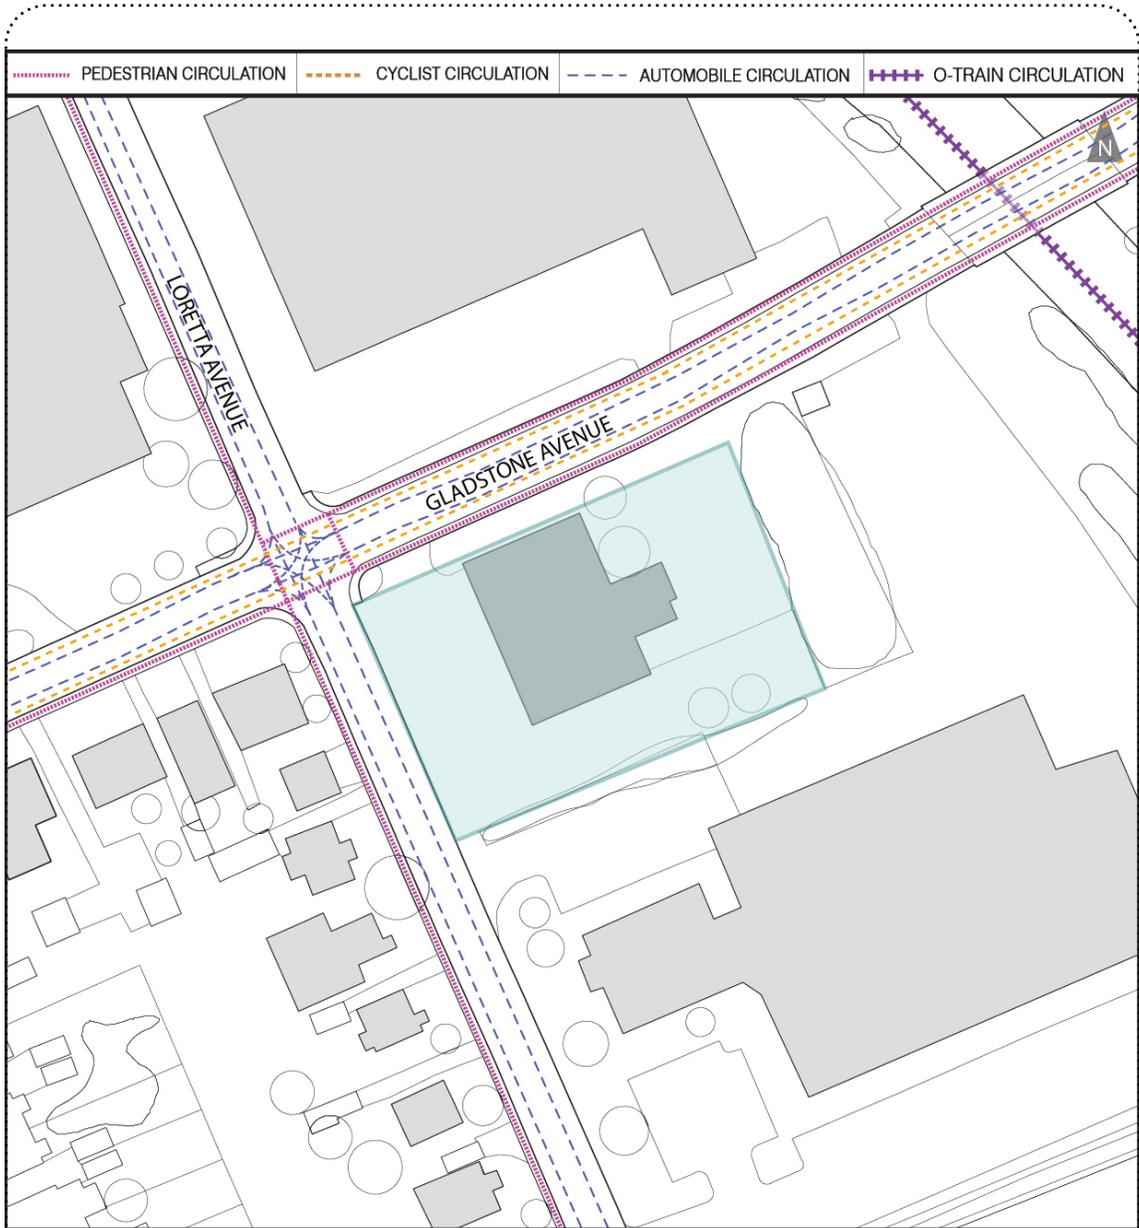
Site/Circulation Plan and Massing Studies at Loretta and Gladstone Site
